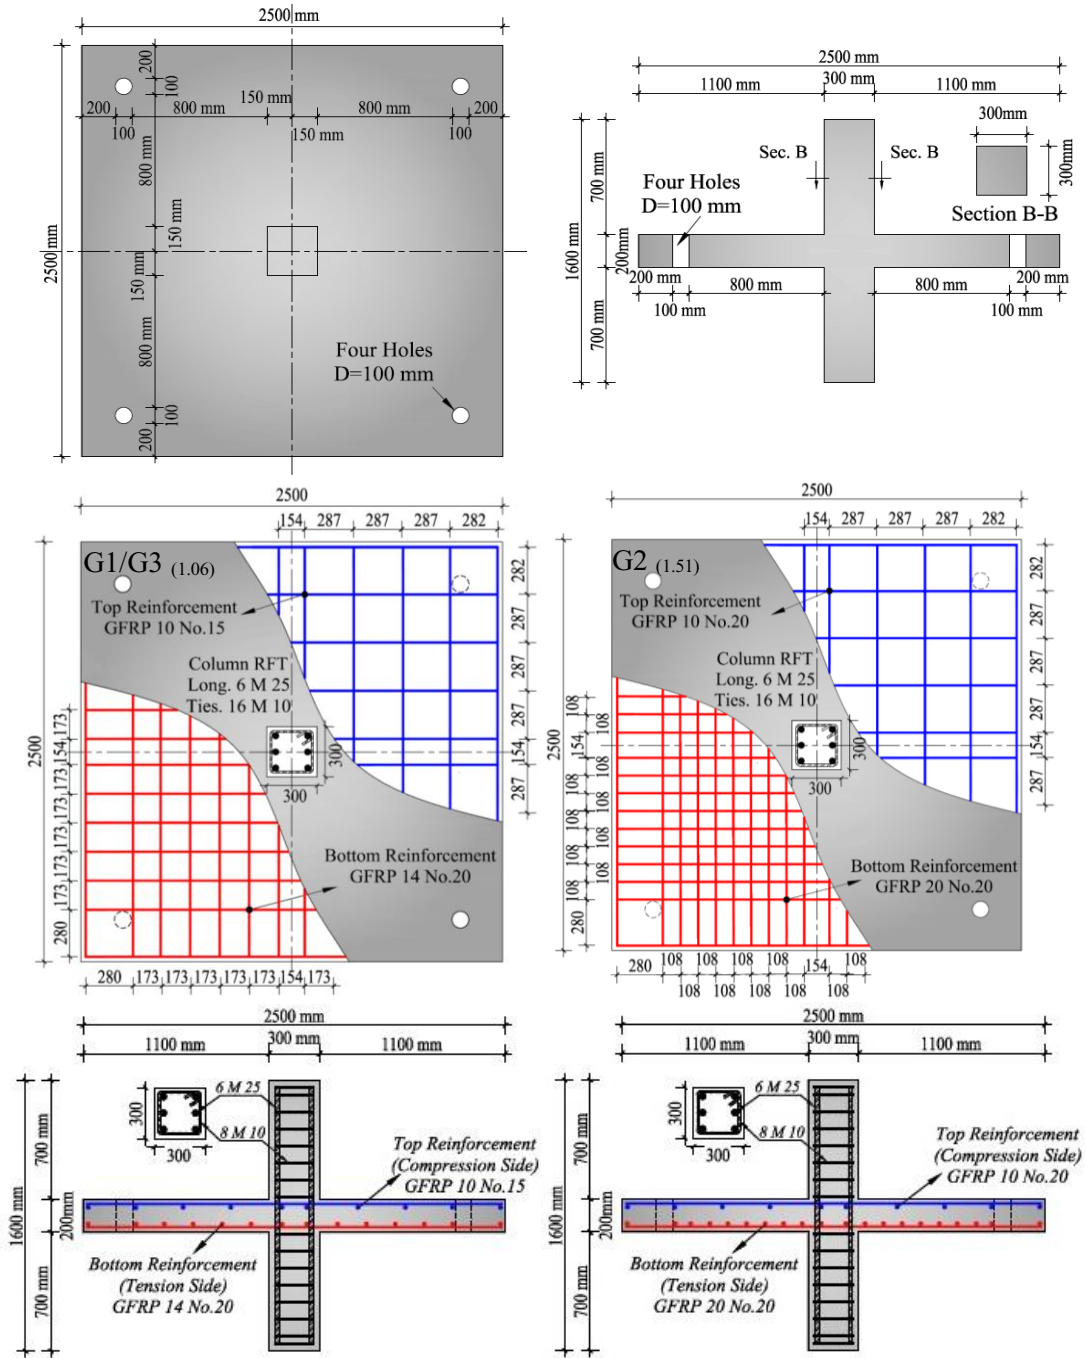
Typical geometry and reinforcement details for all tested specimens.
